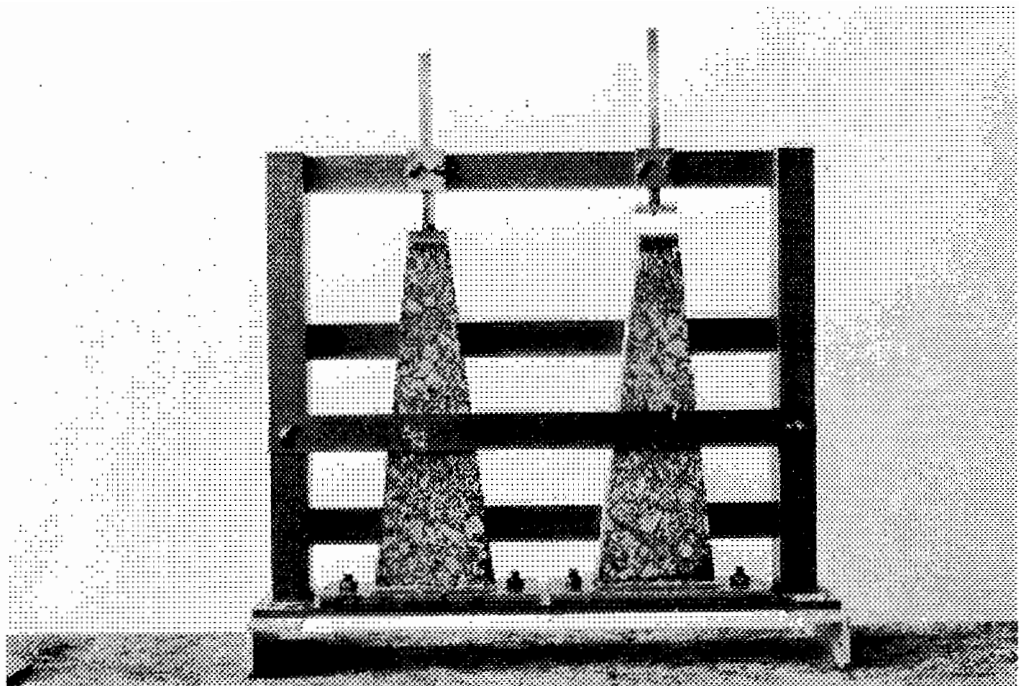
Jig for Fixing End Plates to Trapezoidal Specimens
